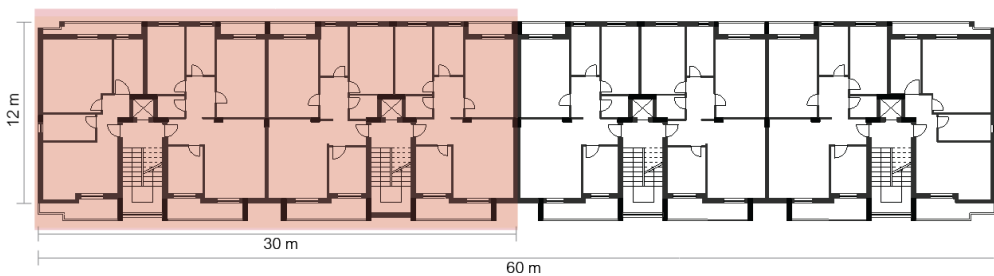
Plan of the typical floor with the identification of the selected construction for structural simulations.
